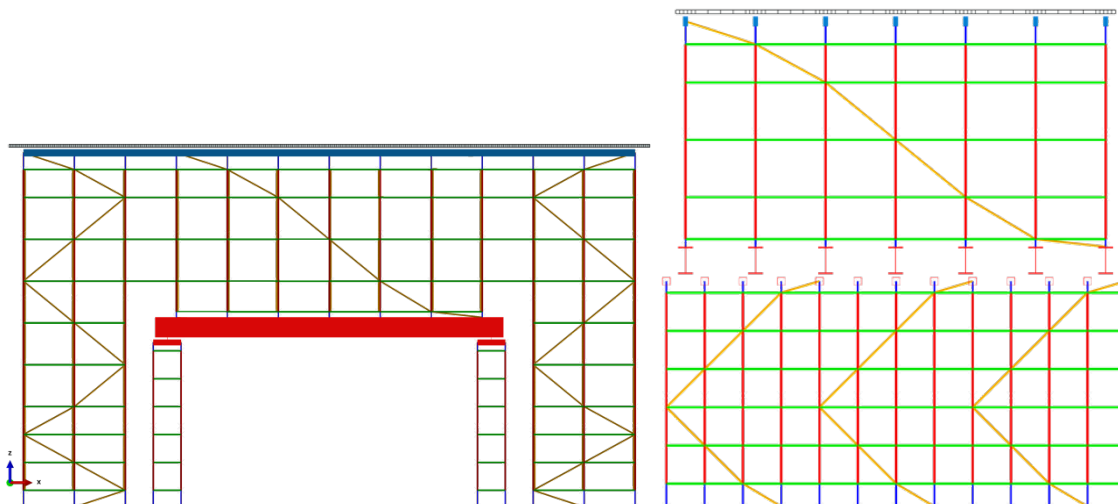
Overview of model M-2 and bracing arrangement along the width of the falsework towers.
